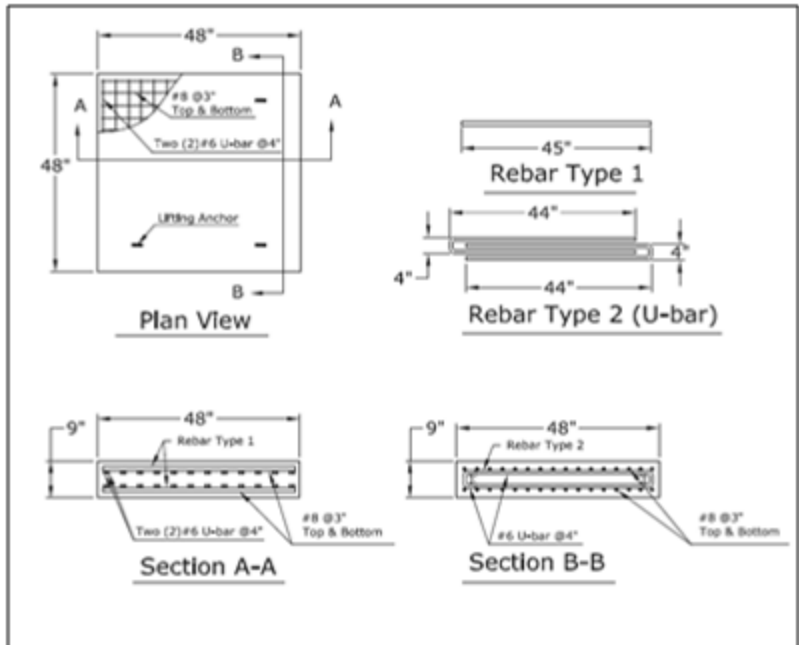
Slab Layout for 48 in. (122 cm) Pipe
